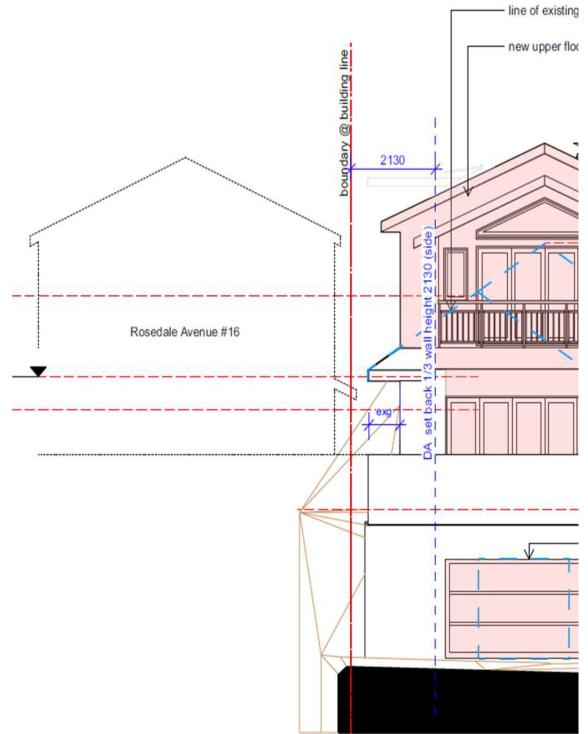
Note the proposed height of the proposed pitched roof is generally consistent with the height of the adjoining and surrounding dwellings in this portion (side) of Rosedale
